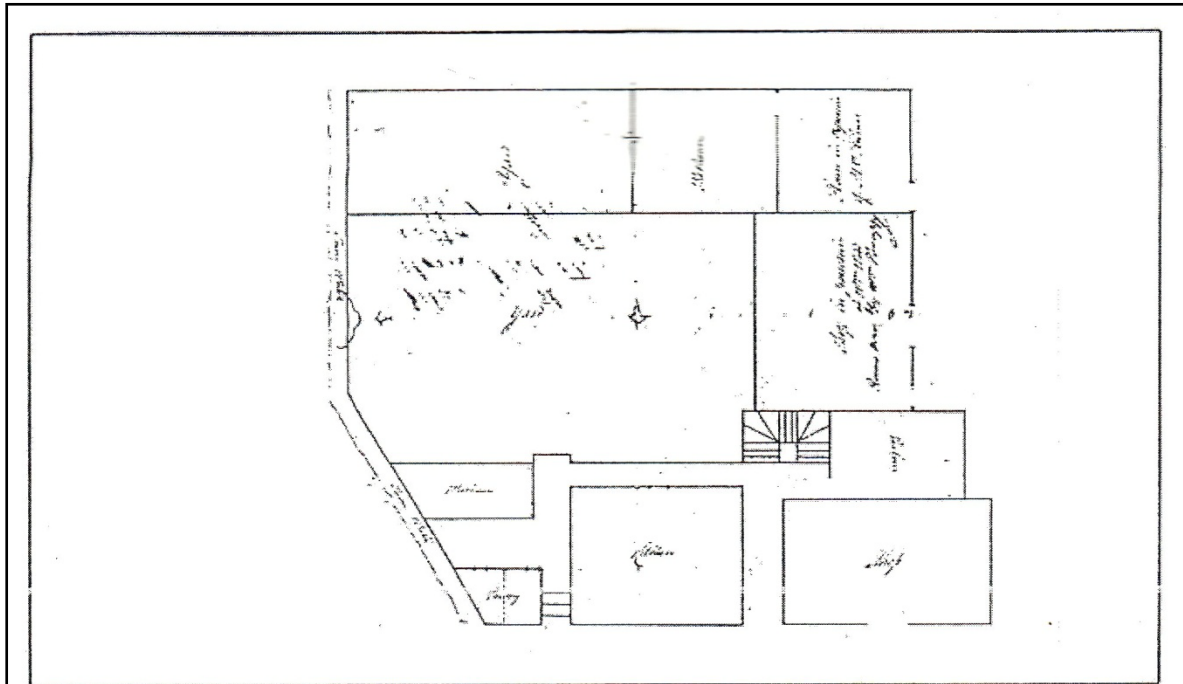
Plan of buildings at the bottom of High Street in 1808 (now 59A, 60, 61 High Street). Note the Town Wall shown on the left. [HMAG MA 164]
